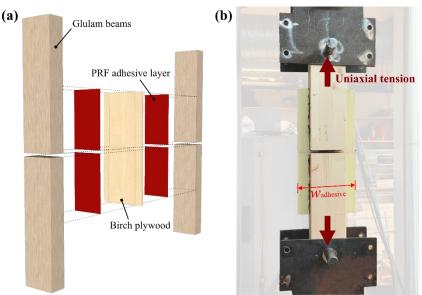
a) Specimen assembly process, and b) test picture of birch plywood specimens bonded with glulam beams via PRF adhesive.
